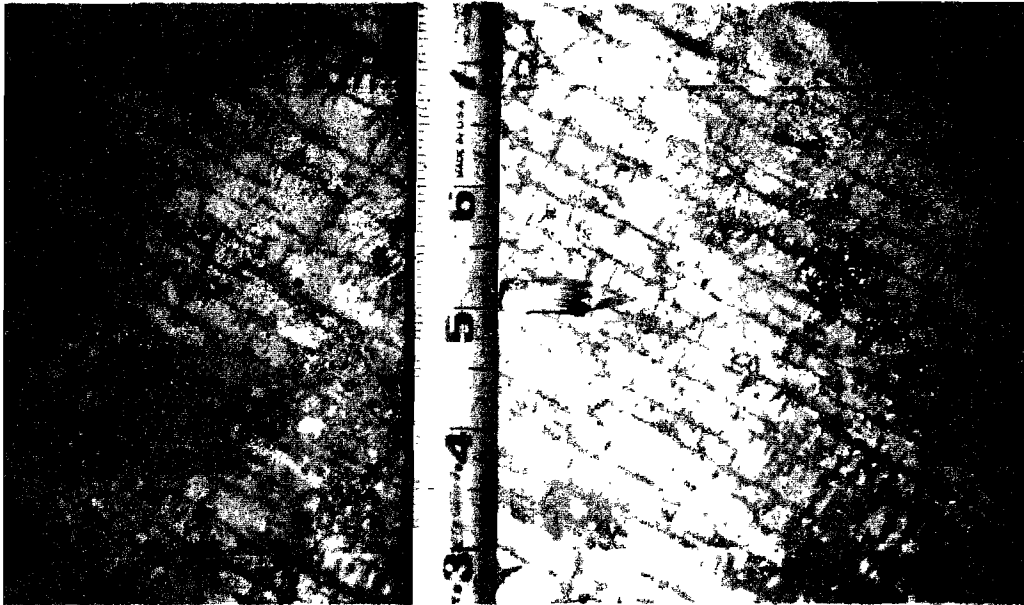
Adhesive surrounding the threaded rod, examined after tensile testing.
